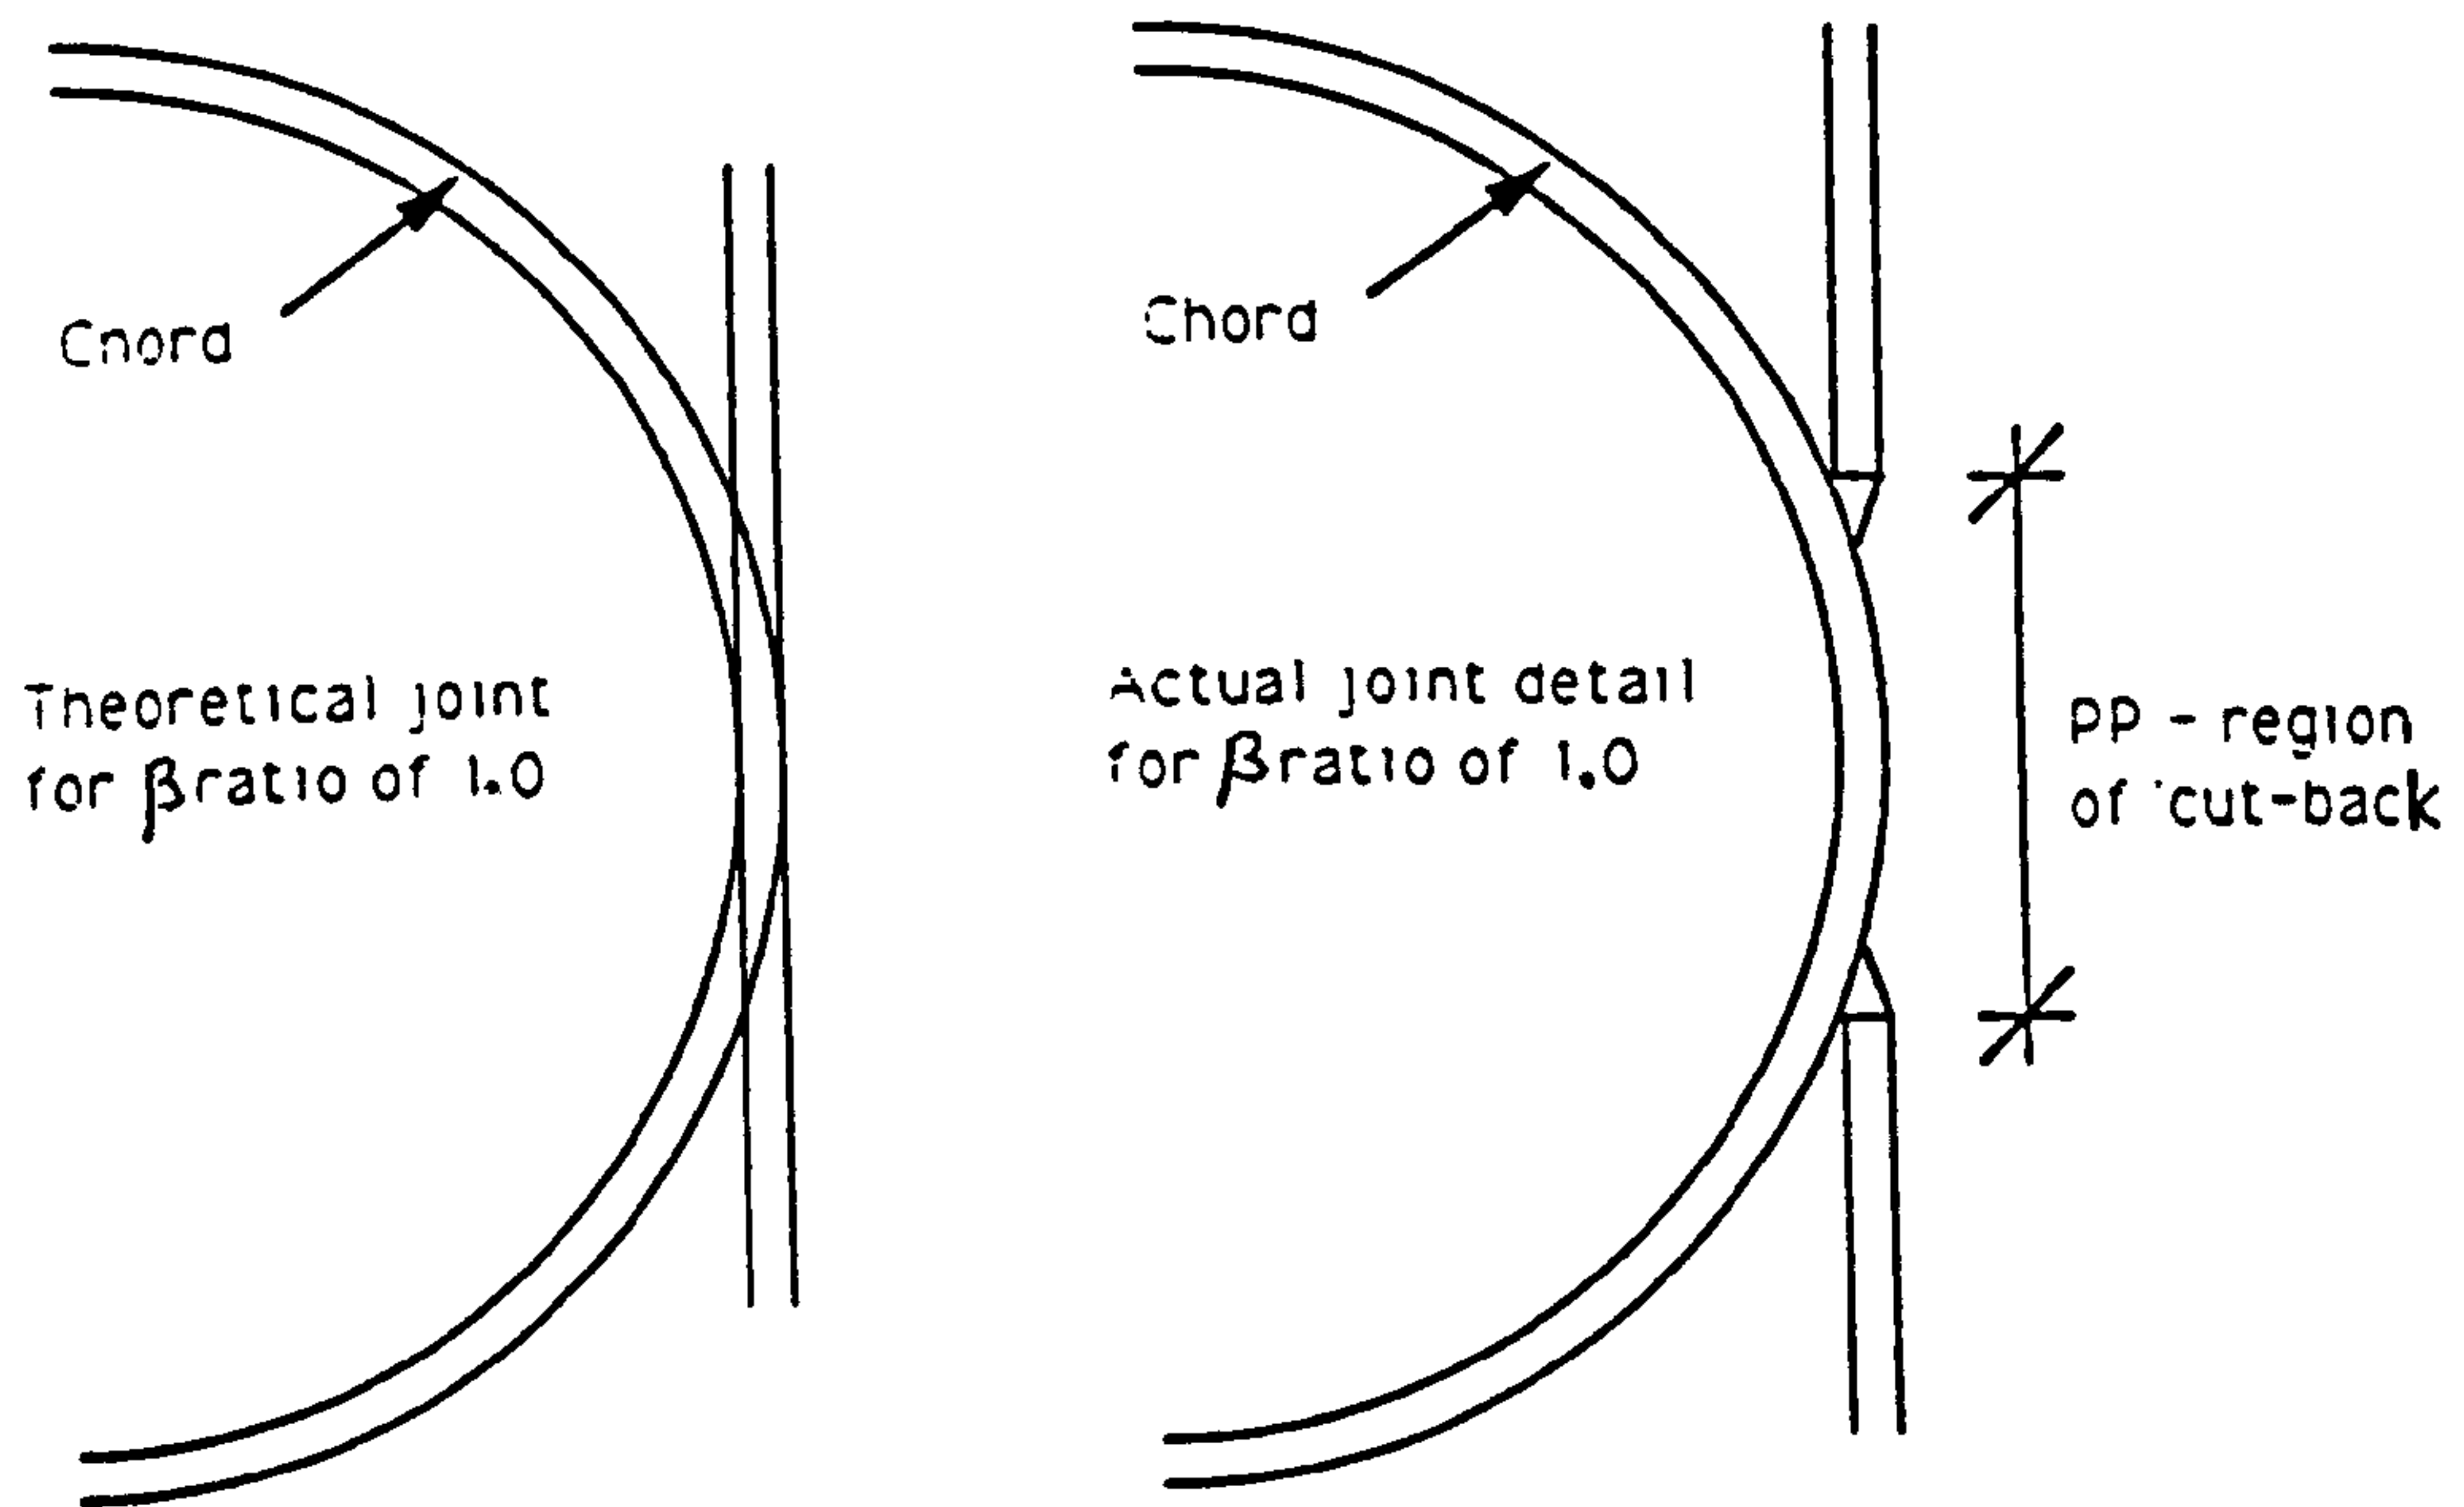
Weld cut back on CHS $\beta = 1.0$ Joints
